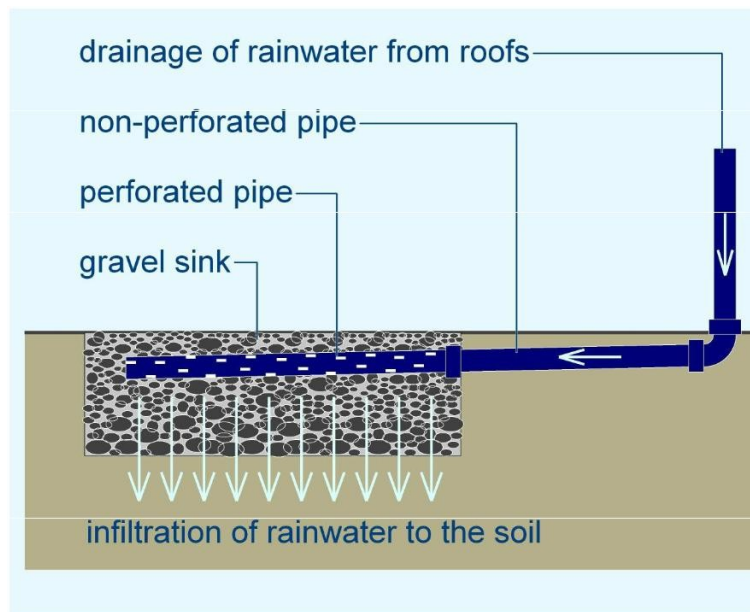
Detail of a pipe for taking rainwater to a gravel spill drain⁶⁵
